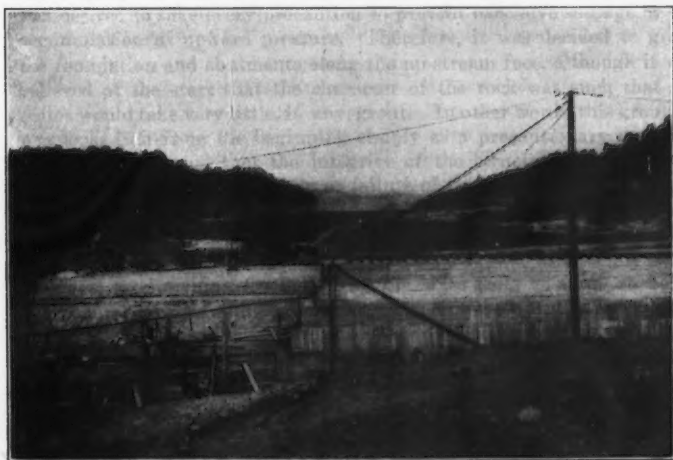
PARTLY COMPLETED CORE-WALL, HINCKSTON RUN DAM. LOOKING NORTH, TOWARD RESERVOIR.
